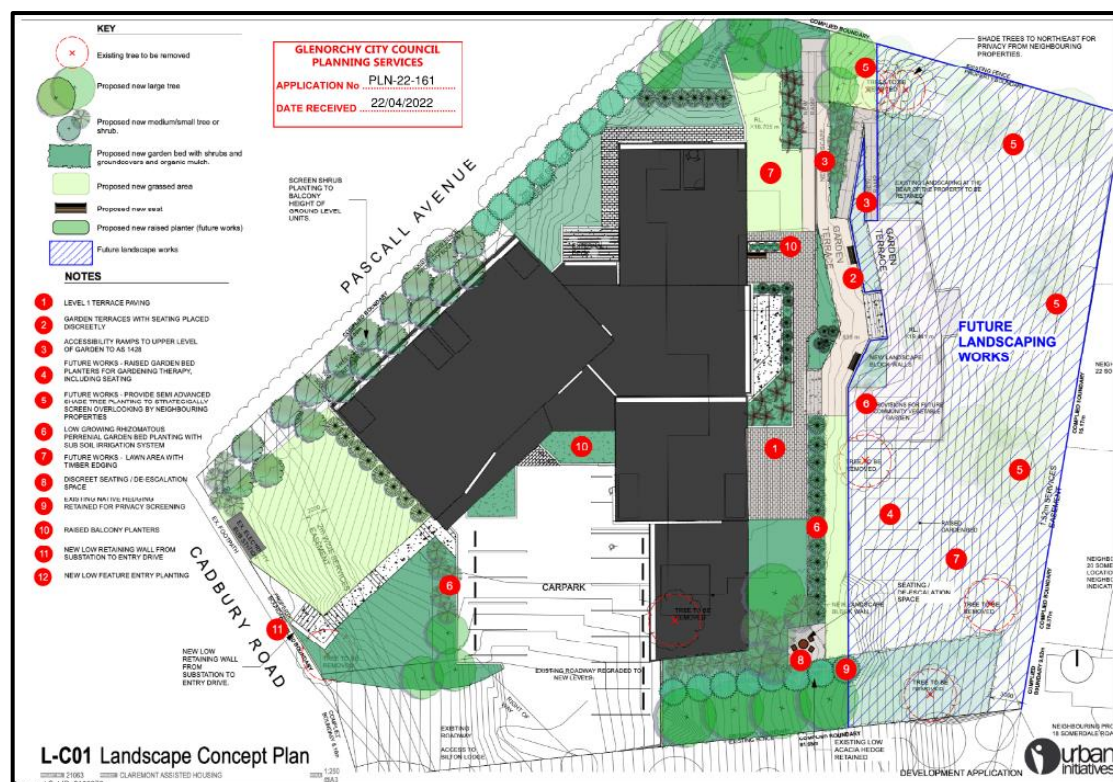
Site/landscape plan of proposal at 59 Cadbury Road, Claremont.
